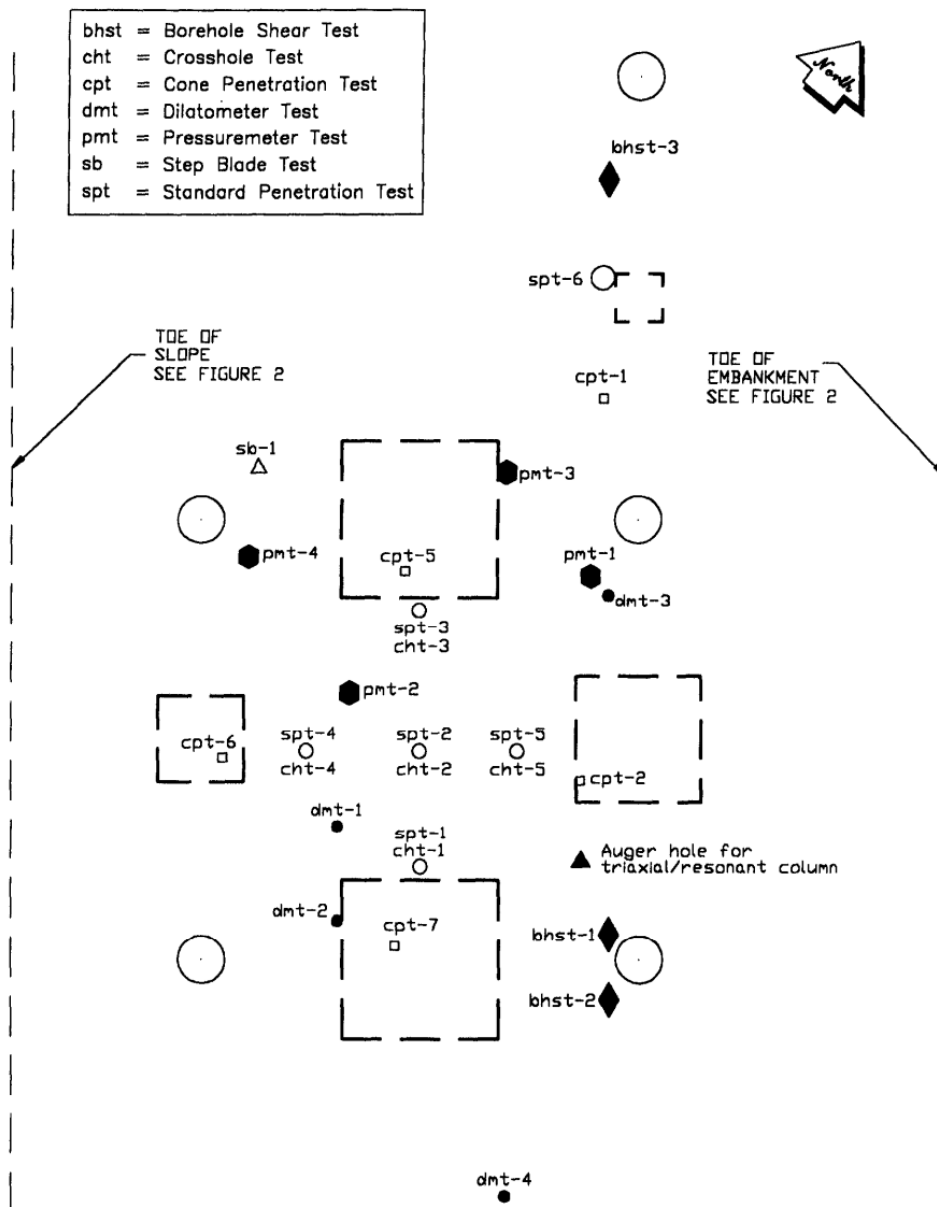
A plan view of footing arrangement at Texas A&M footing load test site(Briaud and Gibbens 1997).
